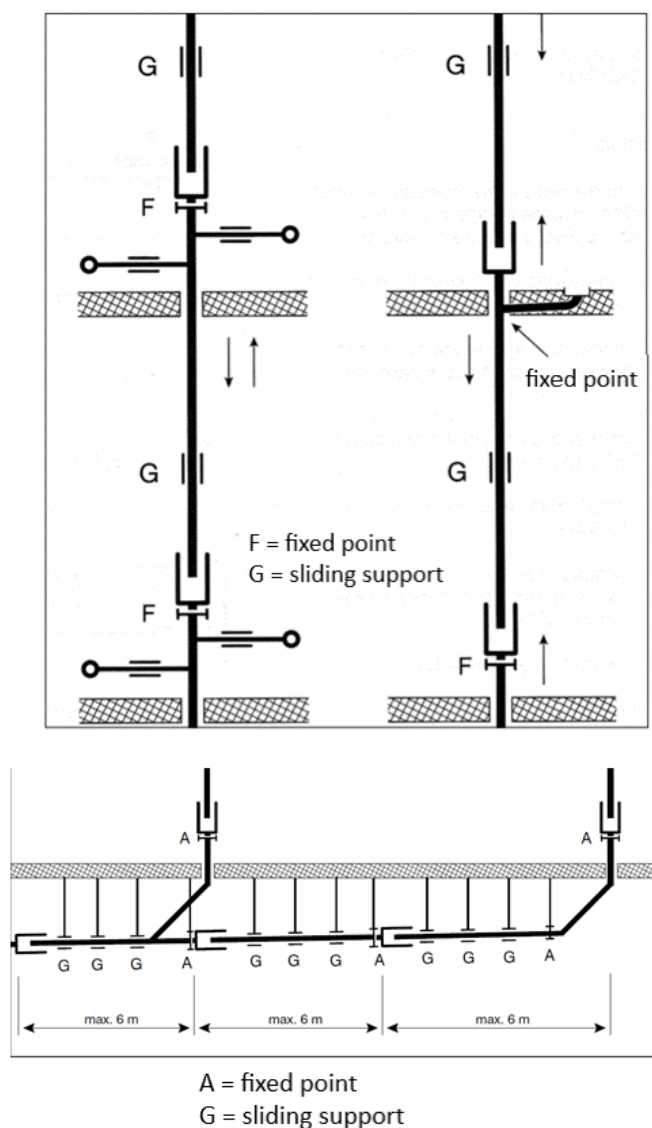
Riser and horizontal pipe installation diagrams for the Geberit Pe system
